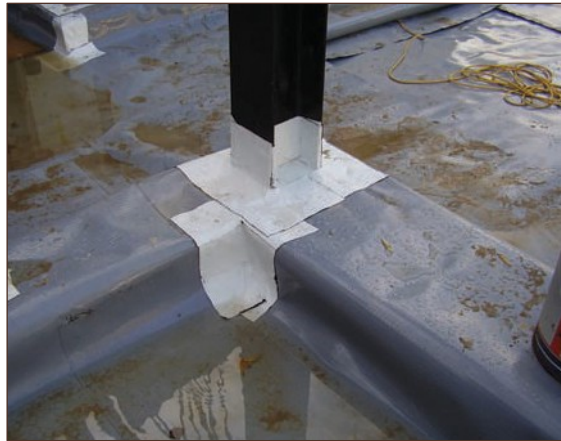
Good detail around stanchion and corner (courtesy PAGeotechnical Ltd)
